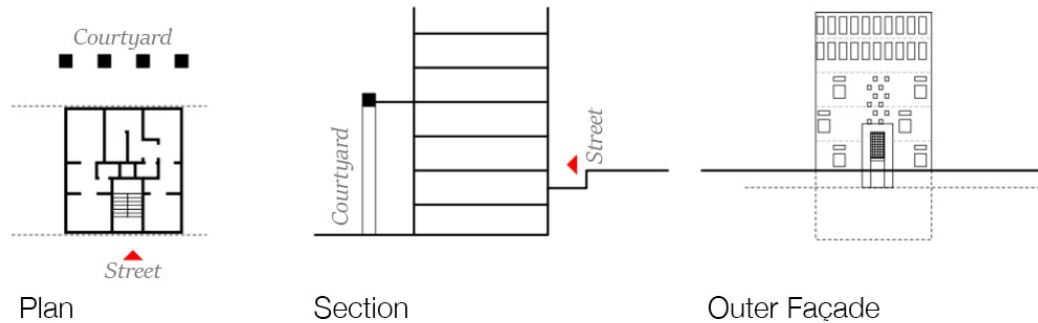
Plan, section and exterior elevation of a block with entrance from the street level.
